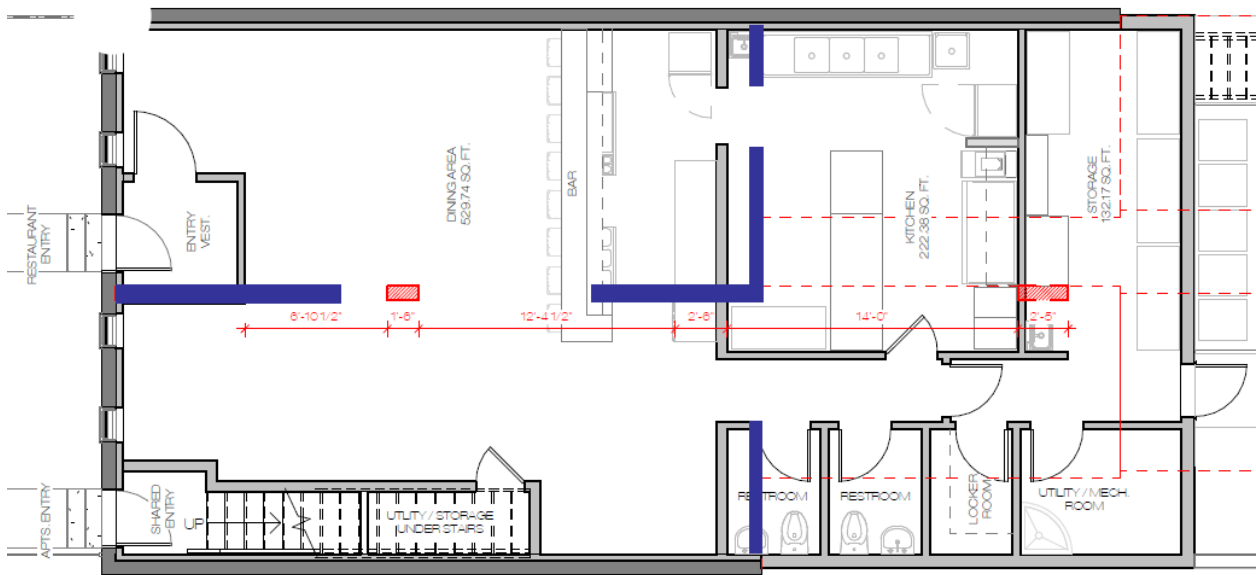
Proposed first floor. Staff recommendation to retain load bearing walls shown in blue
